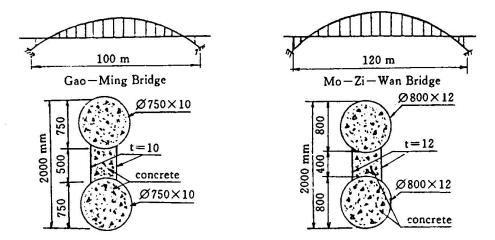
Gao-Ming Bridge and Mo-Zi-Wan Bridge
